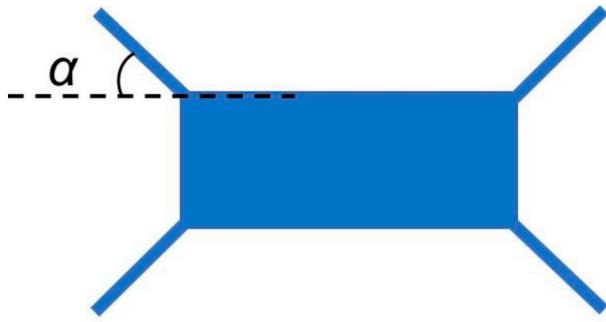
The Wingwall Dimensions Considered in the Survey.
